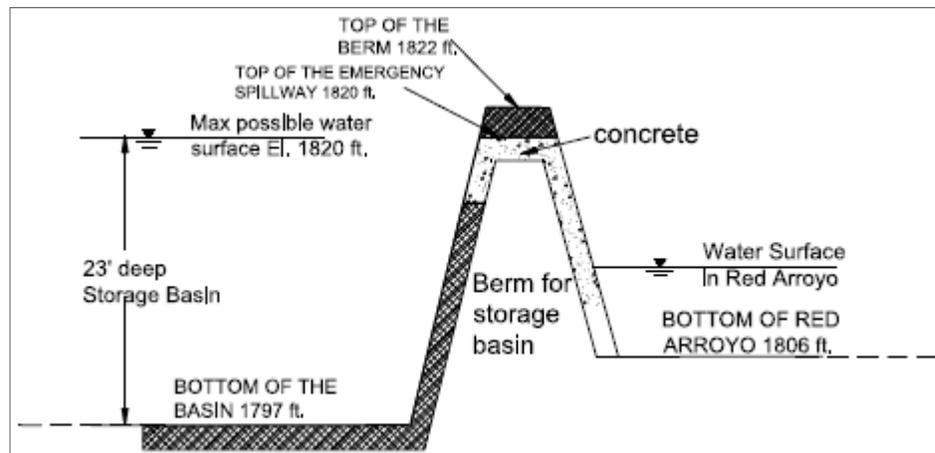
Longitudinal Cross-Section View of Emergency Spillway from the Storage Basin to the Red Arroyo
